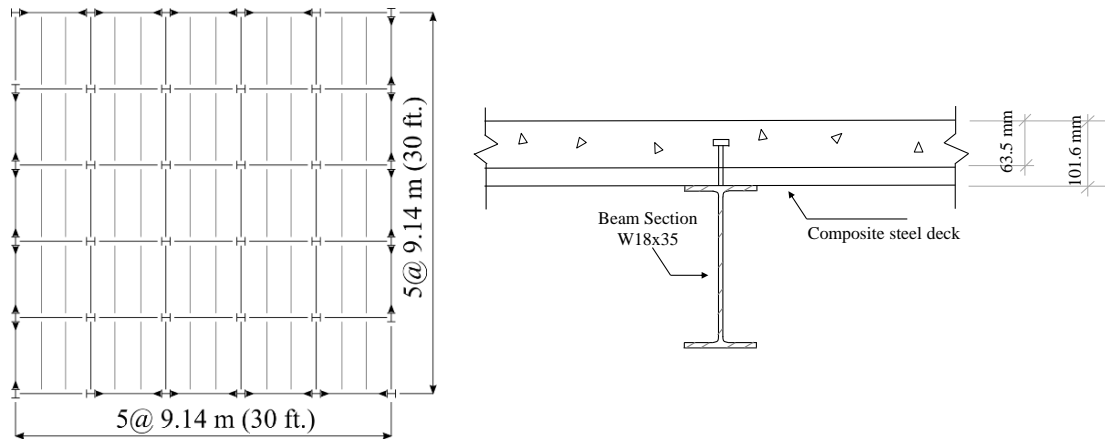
Plan of the 9-story frame and section of a beam and composite slab.
